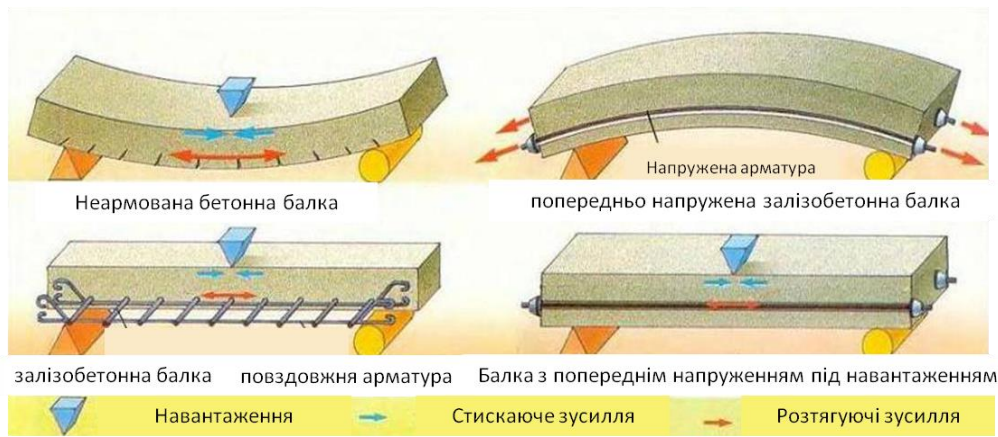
Comparison of stresses in a concrete beam without reinforcement (left) and a prestressed reinforced concrete beam (right)
